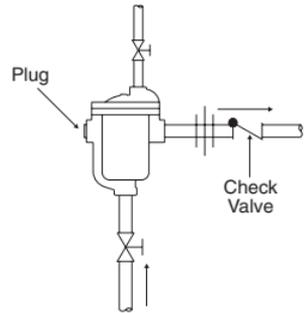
Alternate hookup for No. 800-816 with inlet at bottom.
